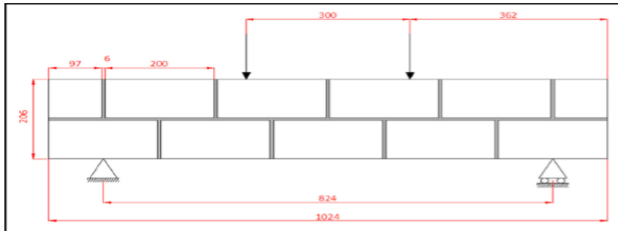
Masonry beam geometry. (Dimensions are in mm) (fayala, 2016).
